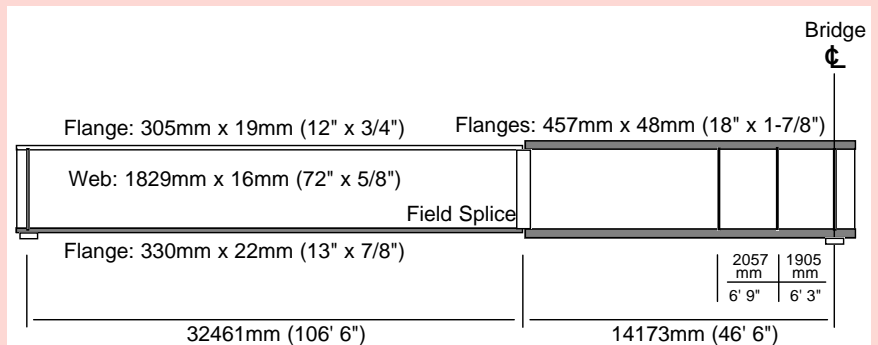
Elevation View of 7 Girder Hybrid Steel Bridge
